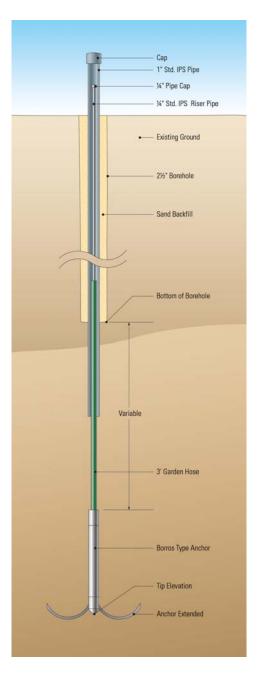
Typical Borros Anchor Settlement/Heave Point.
